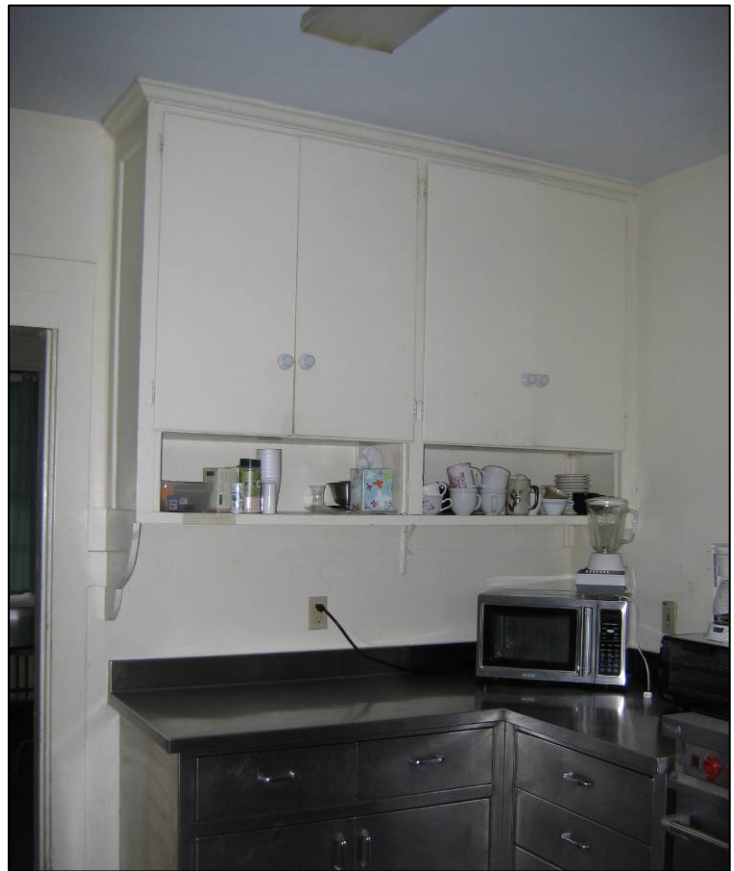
Room 103 (kitchen), altered kitchen- cabinet detail.
